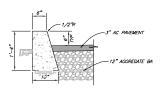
MTS C-2 (PERMEABLE PAVEMENT)
